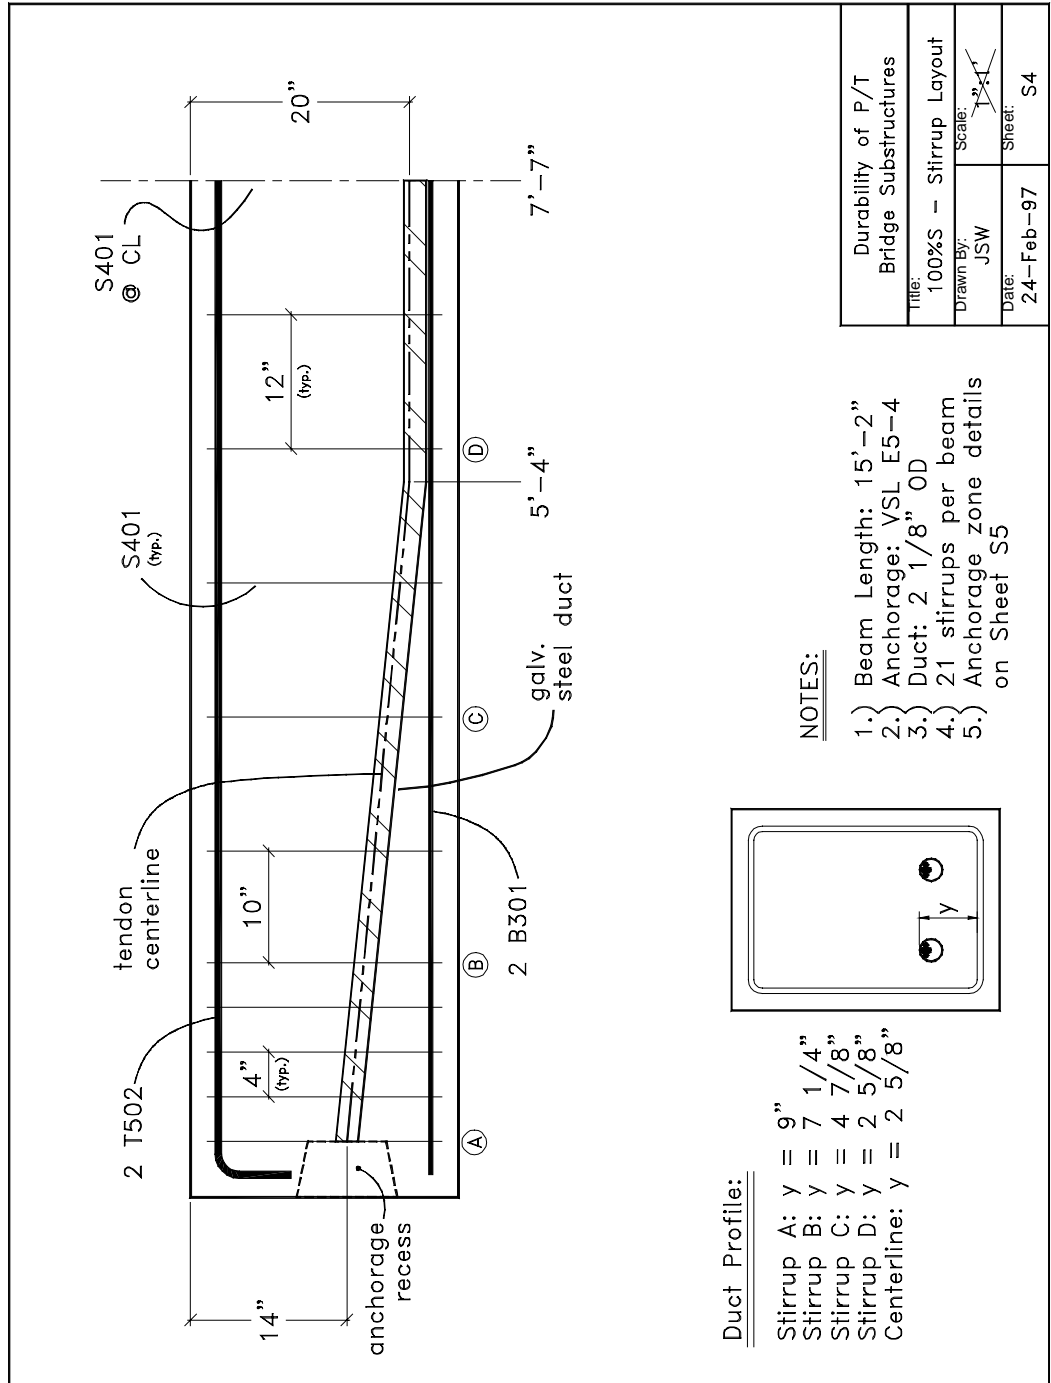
Sheet S4: 100%S Stirrup Layout
